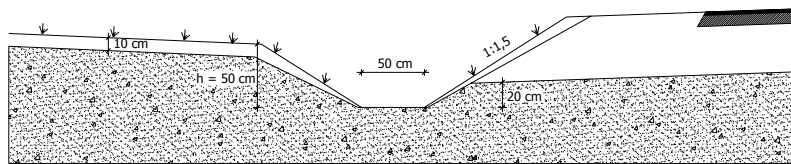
Trapezoidal ditch without stabilized bottom, but with grassed slope (turf, if required) for longitudinal falls of  $J = 0.3\%$  to  $3\%$
